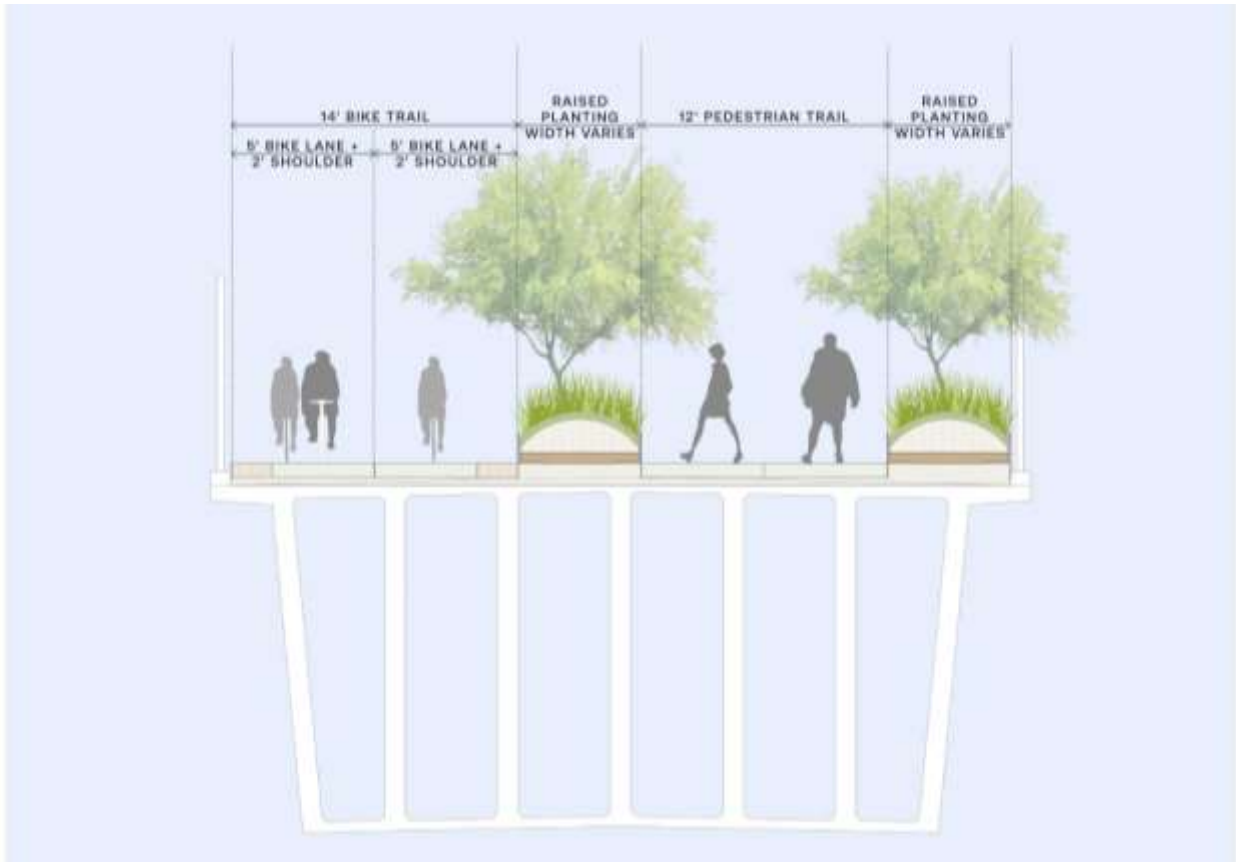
Section of the CIP PT box girder alternative over the I-405 span.
